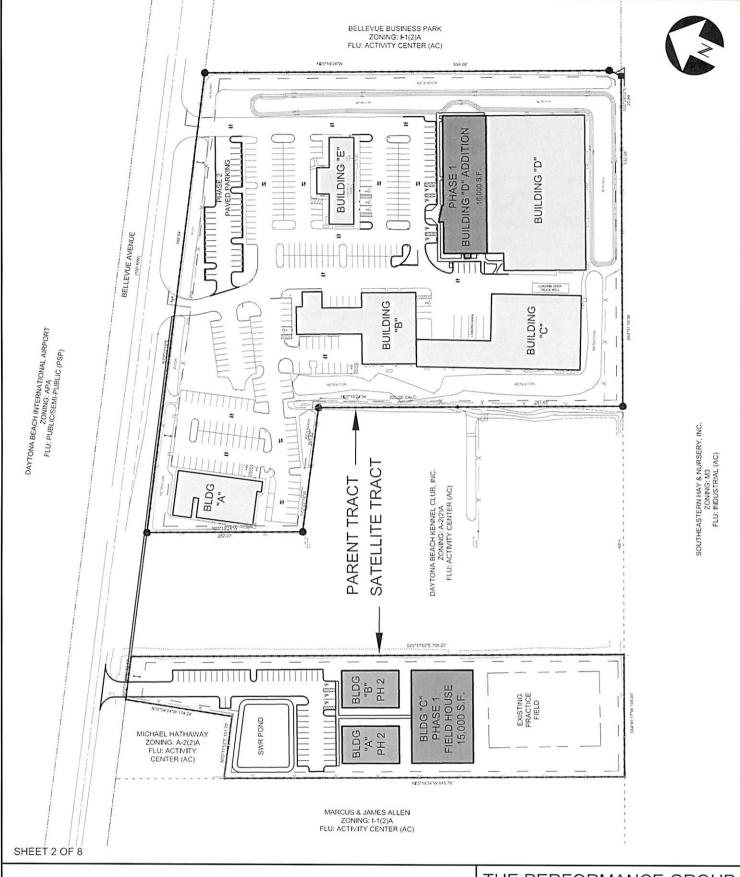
EXHIBIT B - OVERALL DEVELOPMENT PLAN
